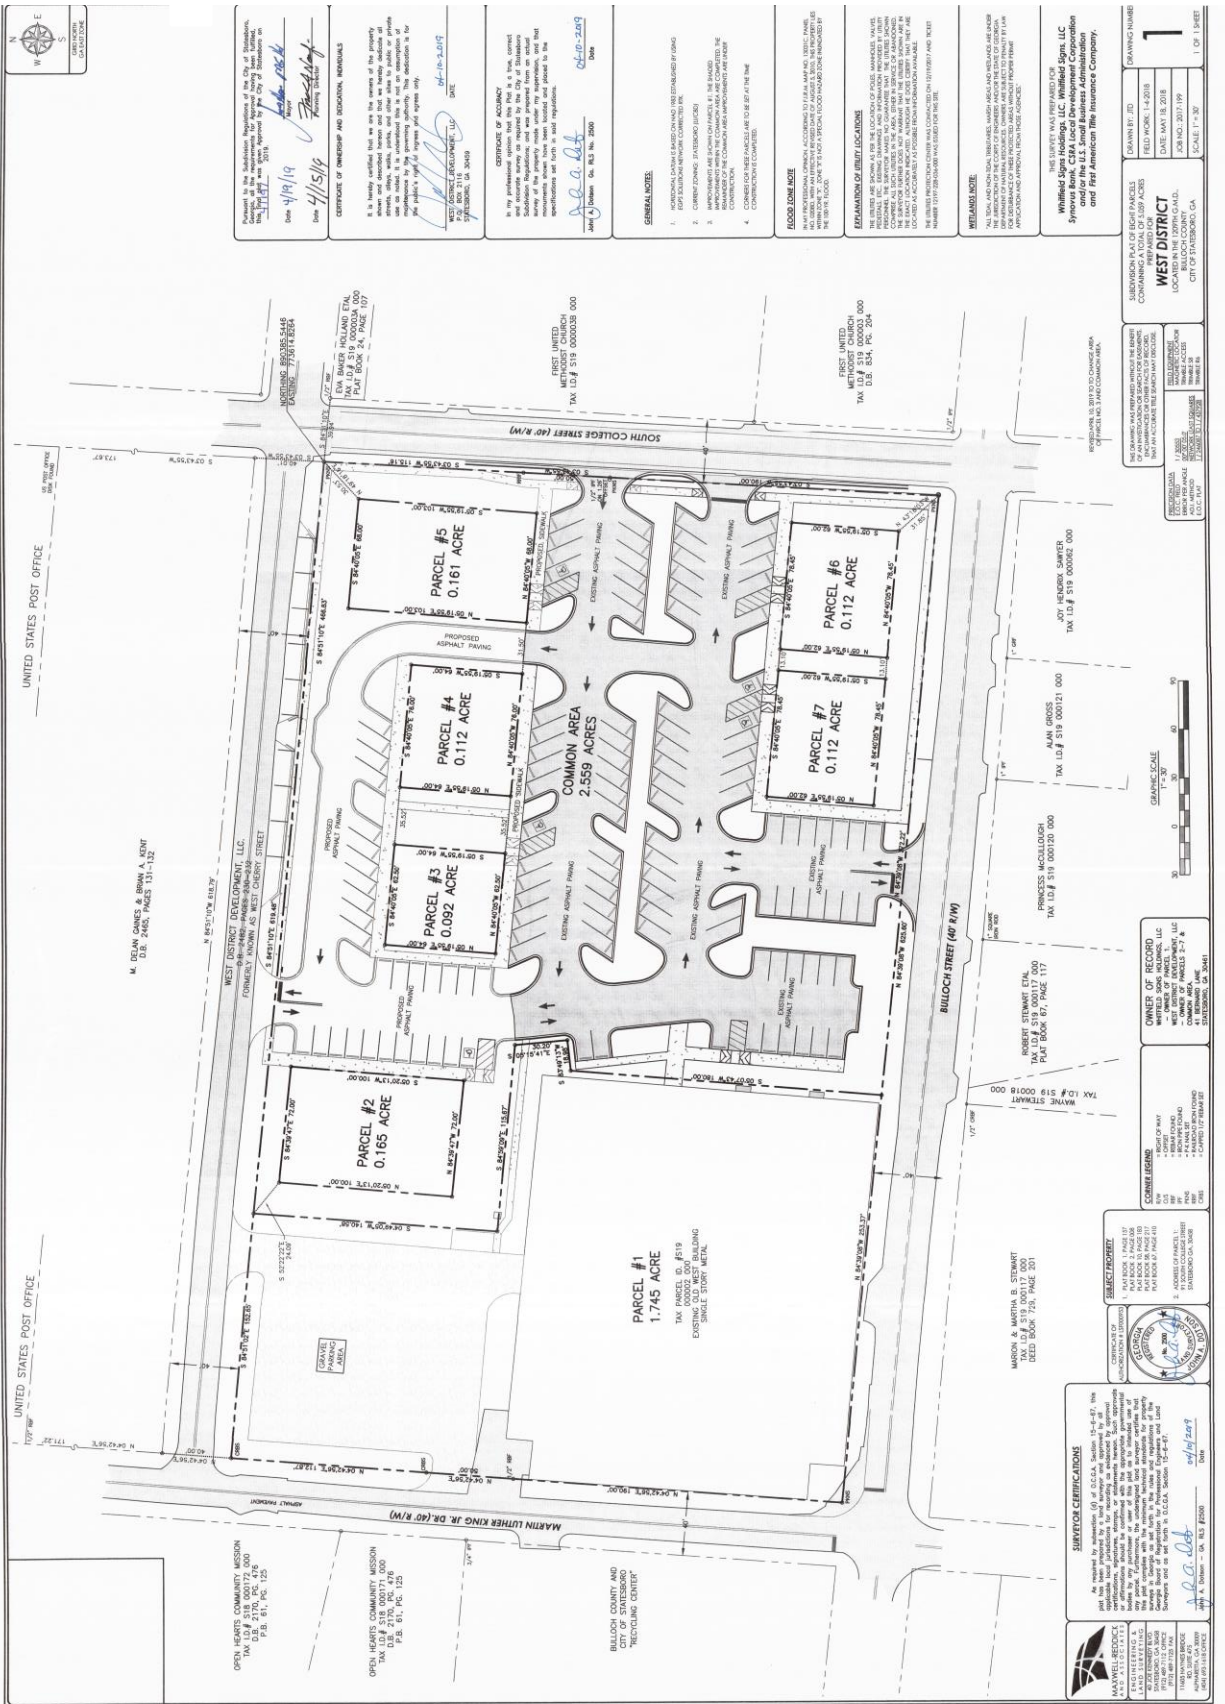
EXHIBIT E: PREVIOUSLY APPROVED SITE PLAN UNDER RZ 19-04-04 (Dated May 18, 2018, then revised April 10, 2019)
